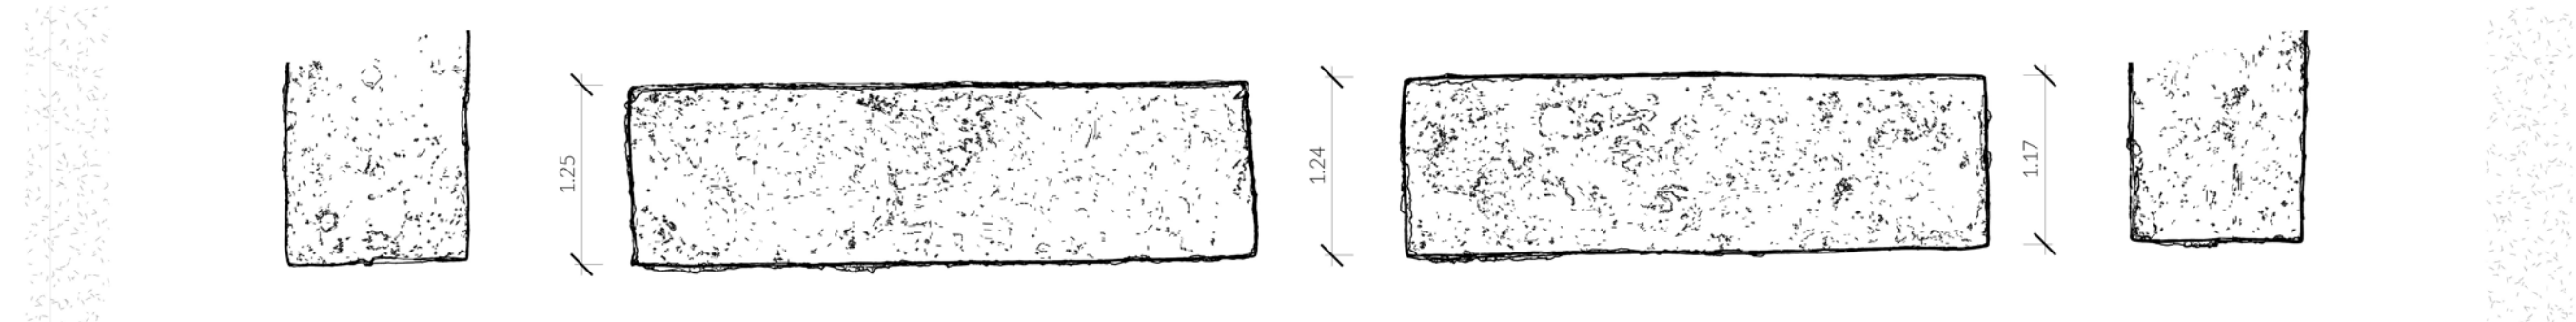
Floor Plan of YKK5 - YKK4 - YKK3 - YKK2, 1: 50
